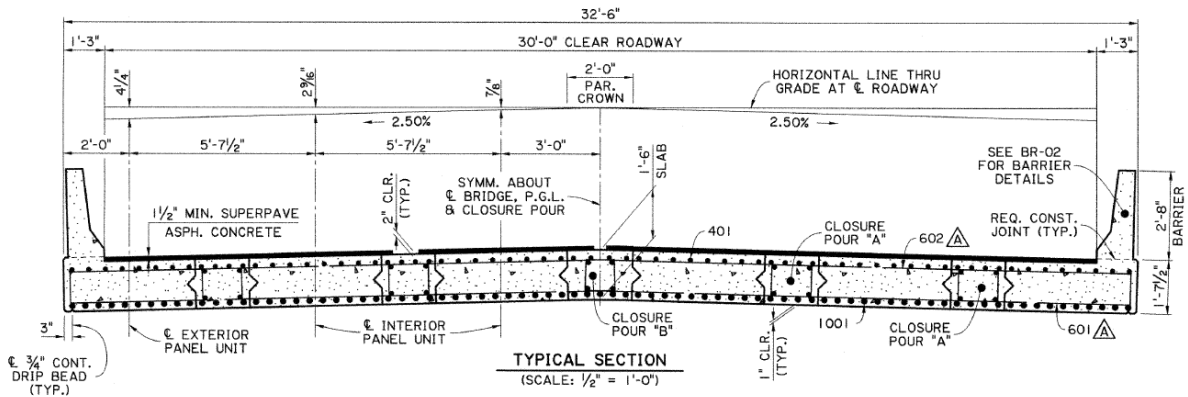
Diagram. A typical section of Unnamed Creek Bridge.
